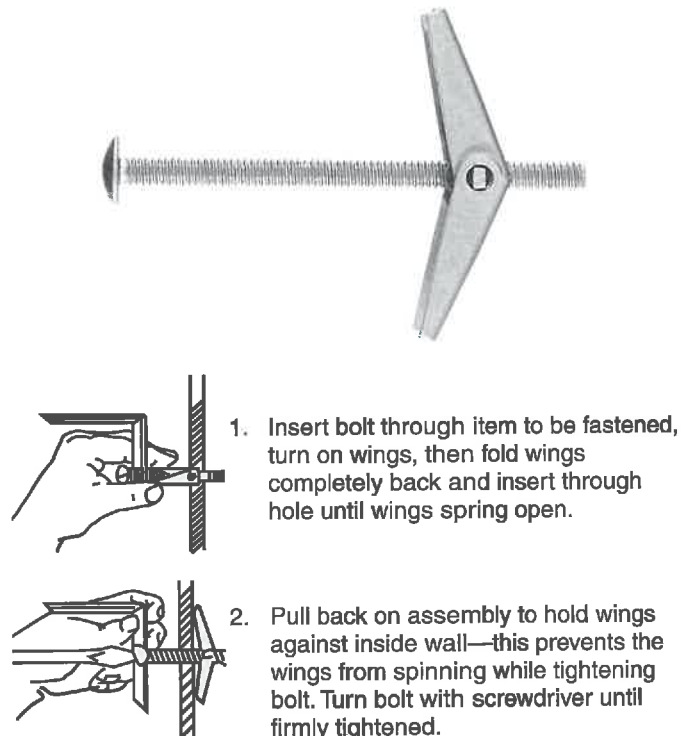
Toggle bolts attach fixtures to hollow walls. (The Rawlplug Co.)
